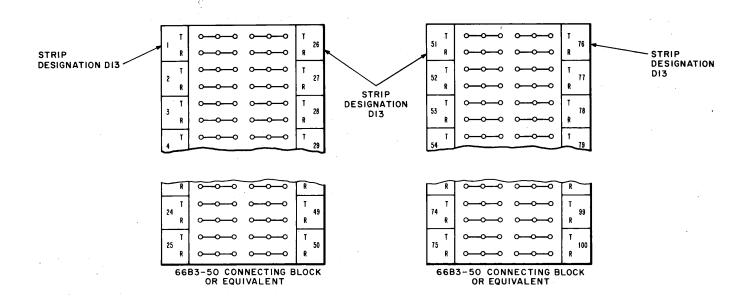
Typical Cross-Connecting Block Arrangement for 100-Pair Line Cable
